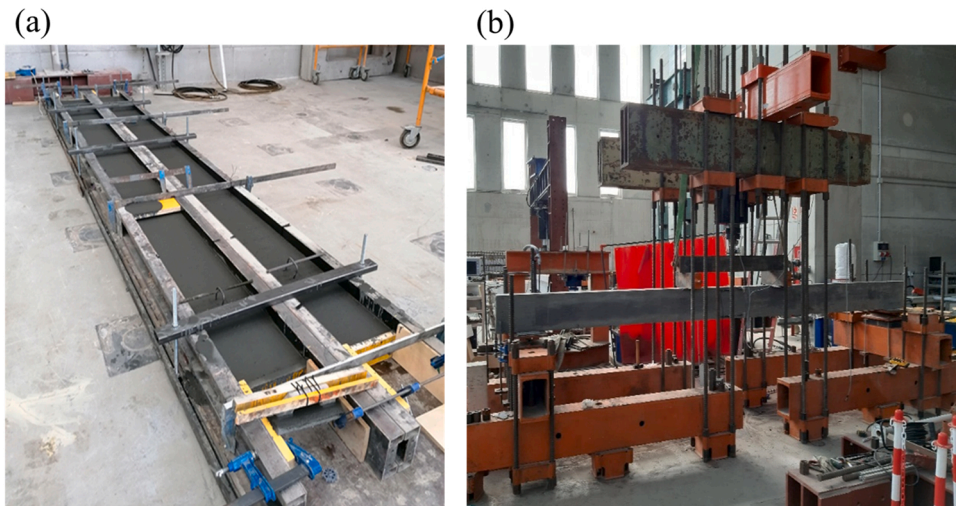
UHPFRC long beams: (a) overview of the casting zone and (b) testing setup.
